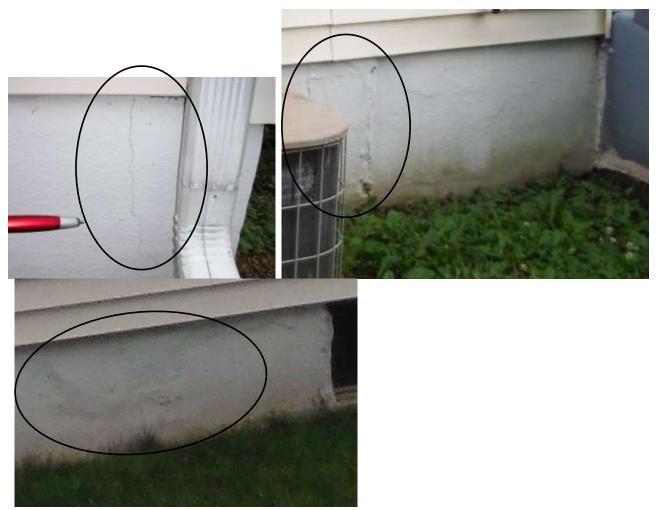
Examples of foundation cracks & patched cement on home as viewed from exterior. Have a foundation repair contractor or structural mason evaluate/repair all cracks/damage where needed. Inspect basement & crawl spaces when made accessible; see basement & crawl space section comments.
